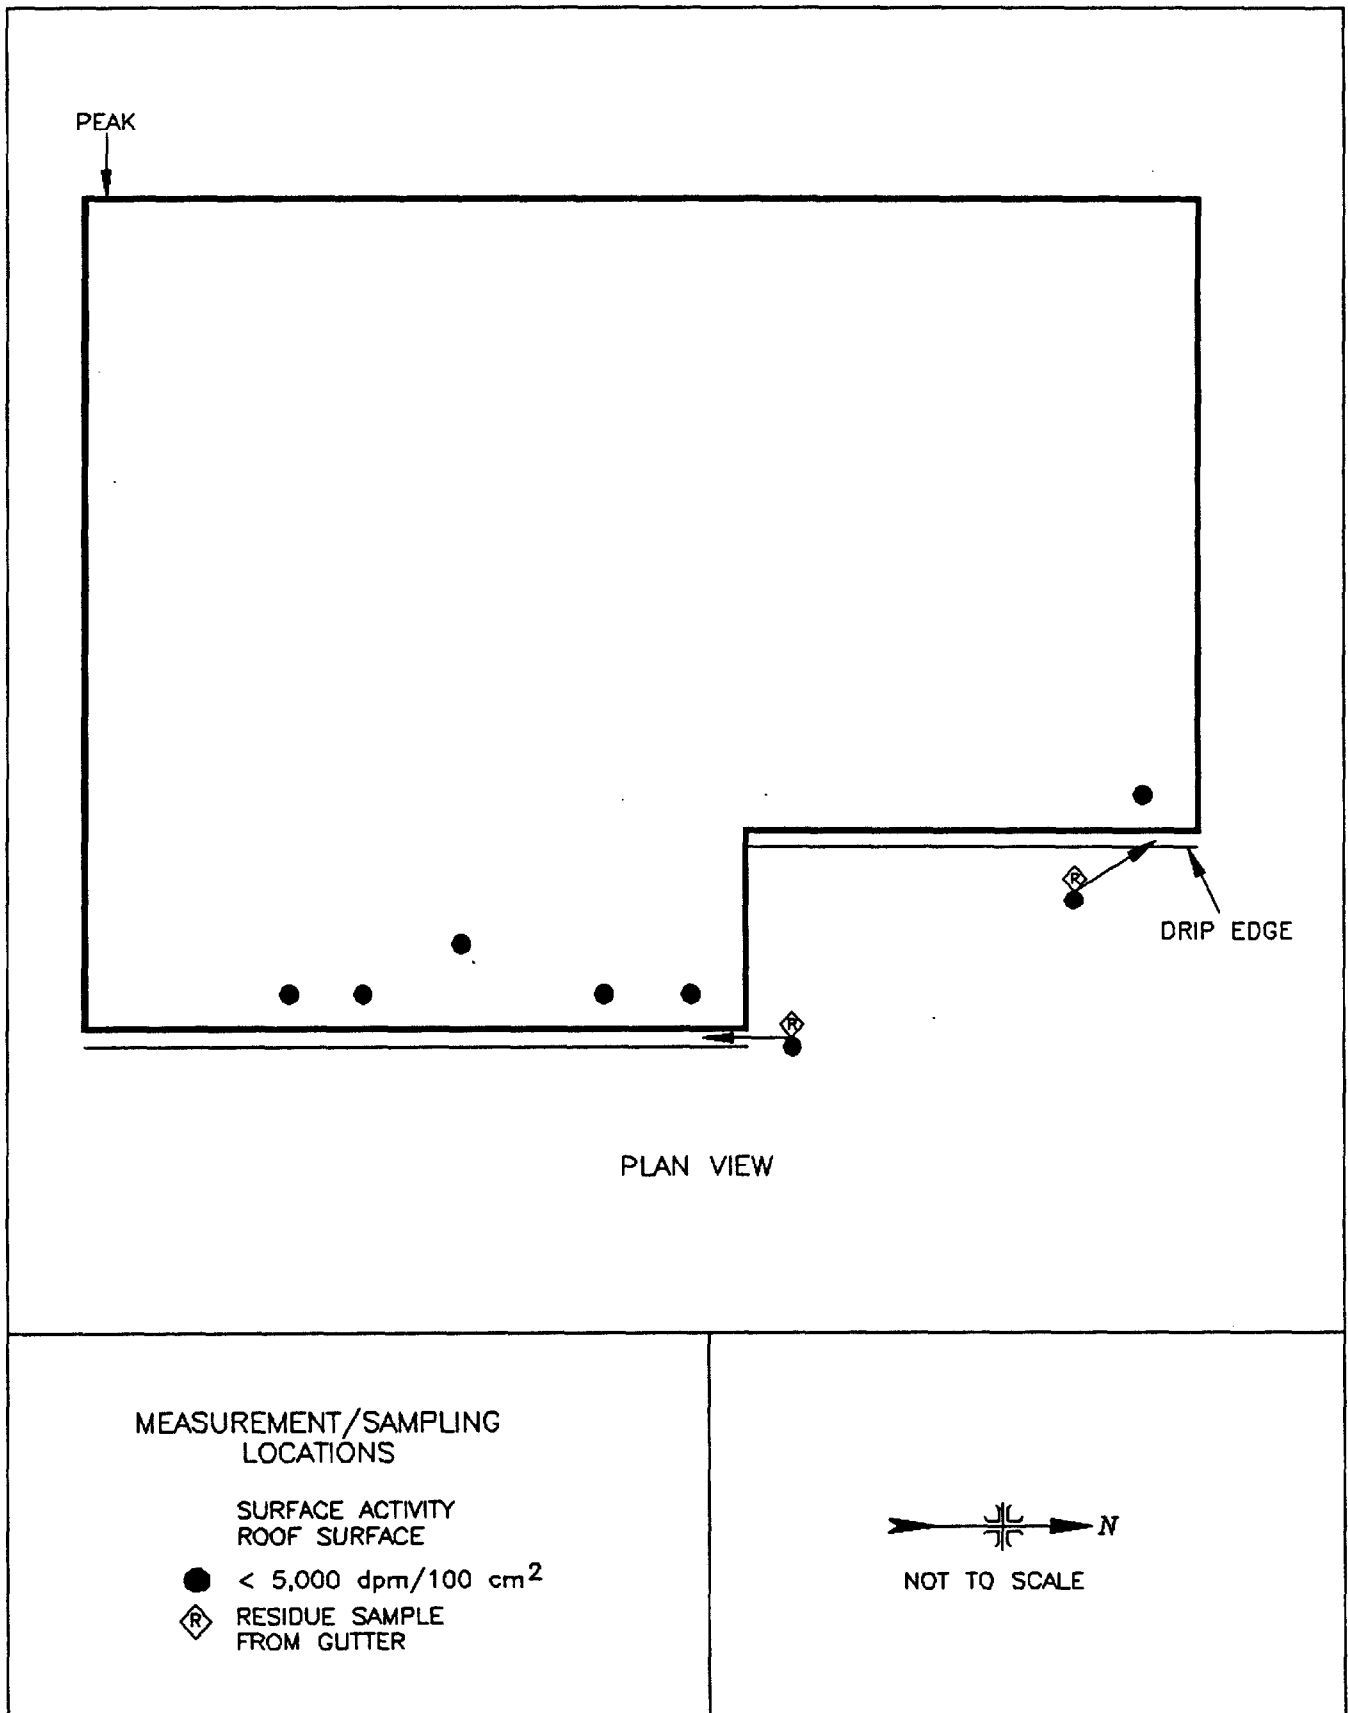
Building 3, East Roof – Measurement and Sampling Locations
